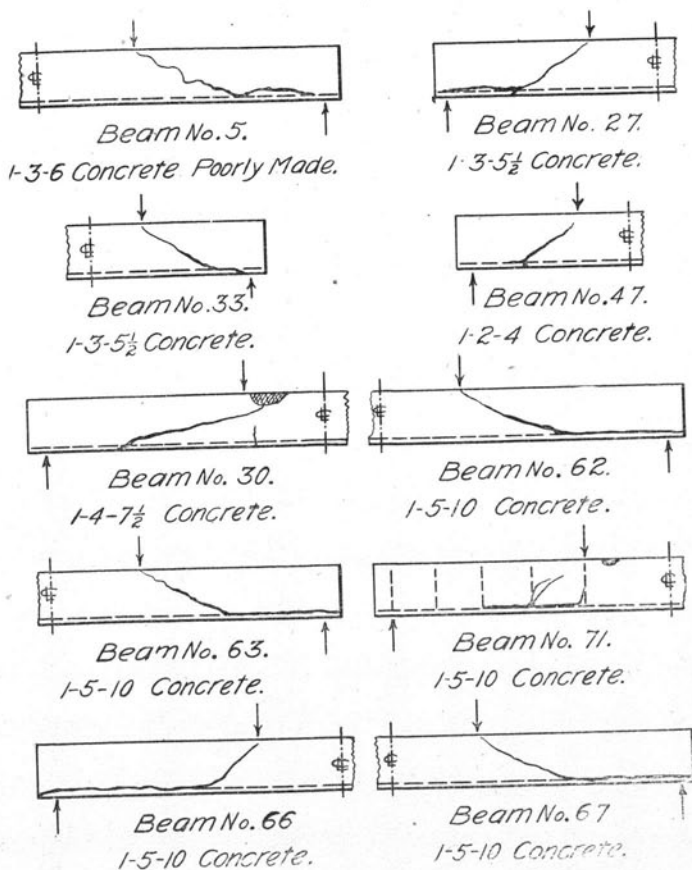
SKETCHES SHOWING BEAMS AFTER FAILURE.
